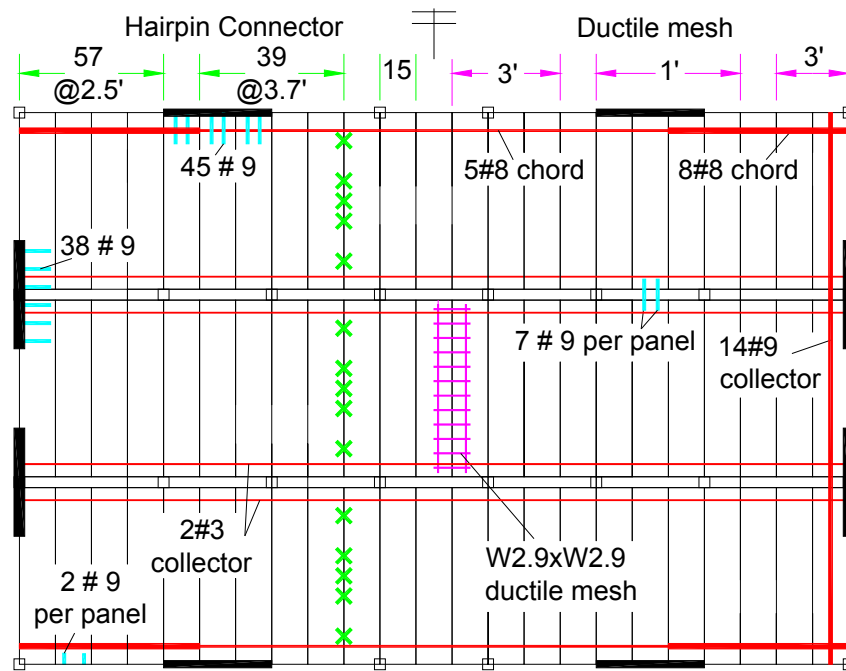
Diaphragm reinforcement design for design example 4A.
